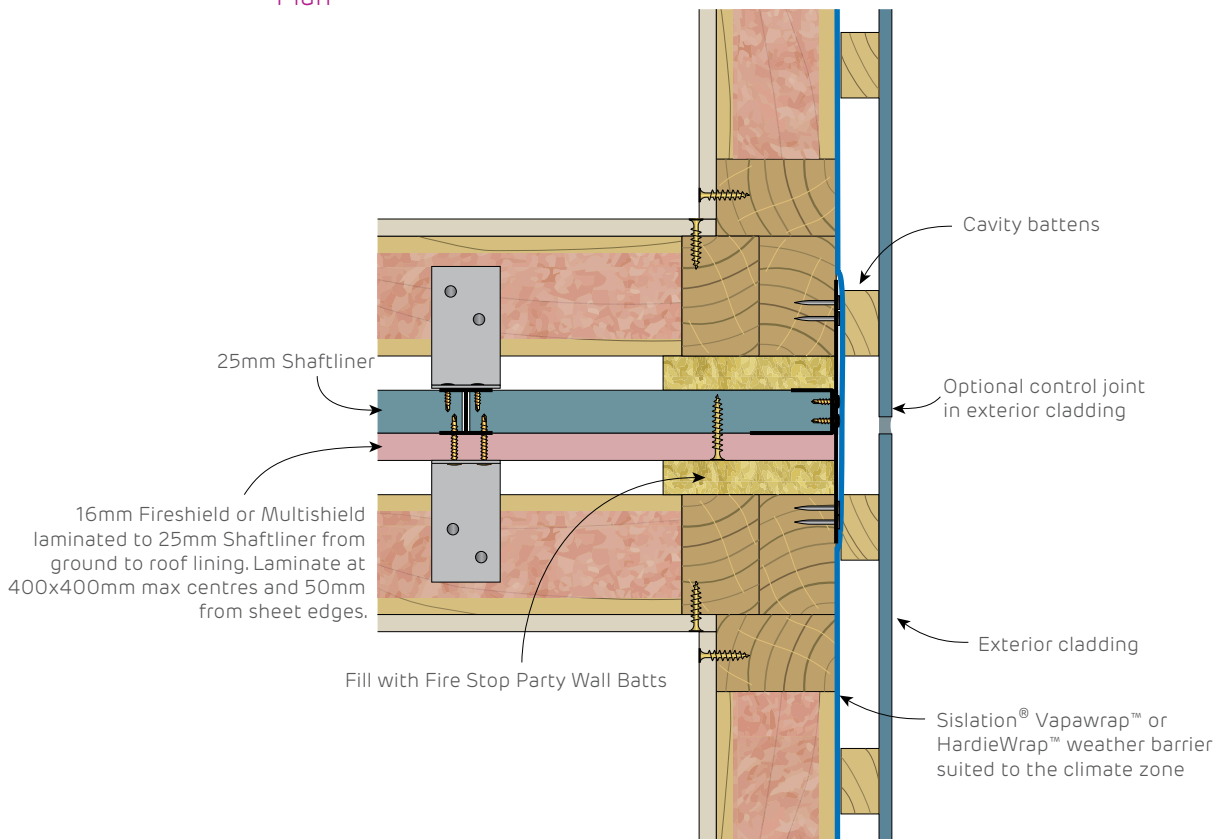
Interhome Wall to External Clad Wall with Cavity Battens
